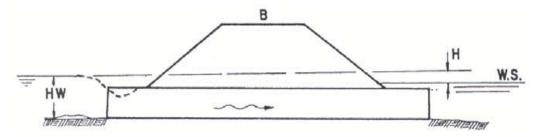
Outlet Submerged, Inlet Unsubmerged [Source: FHWA, 2005].
